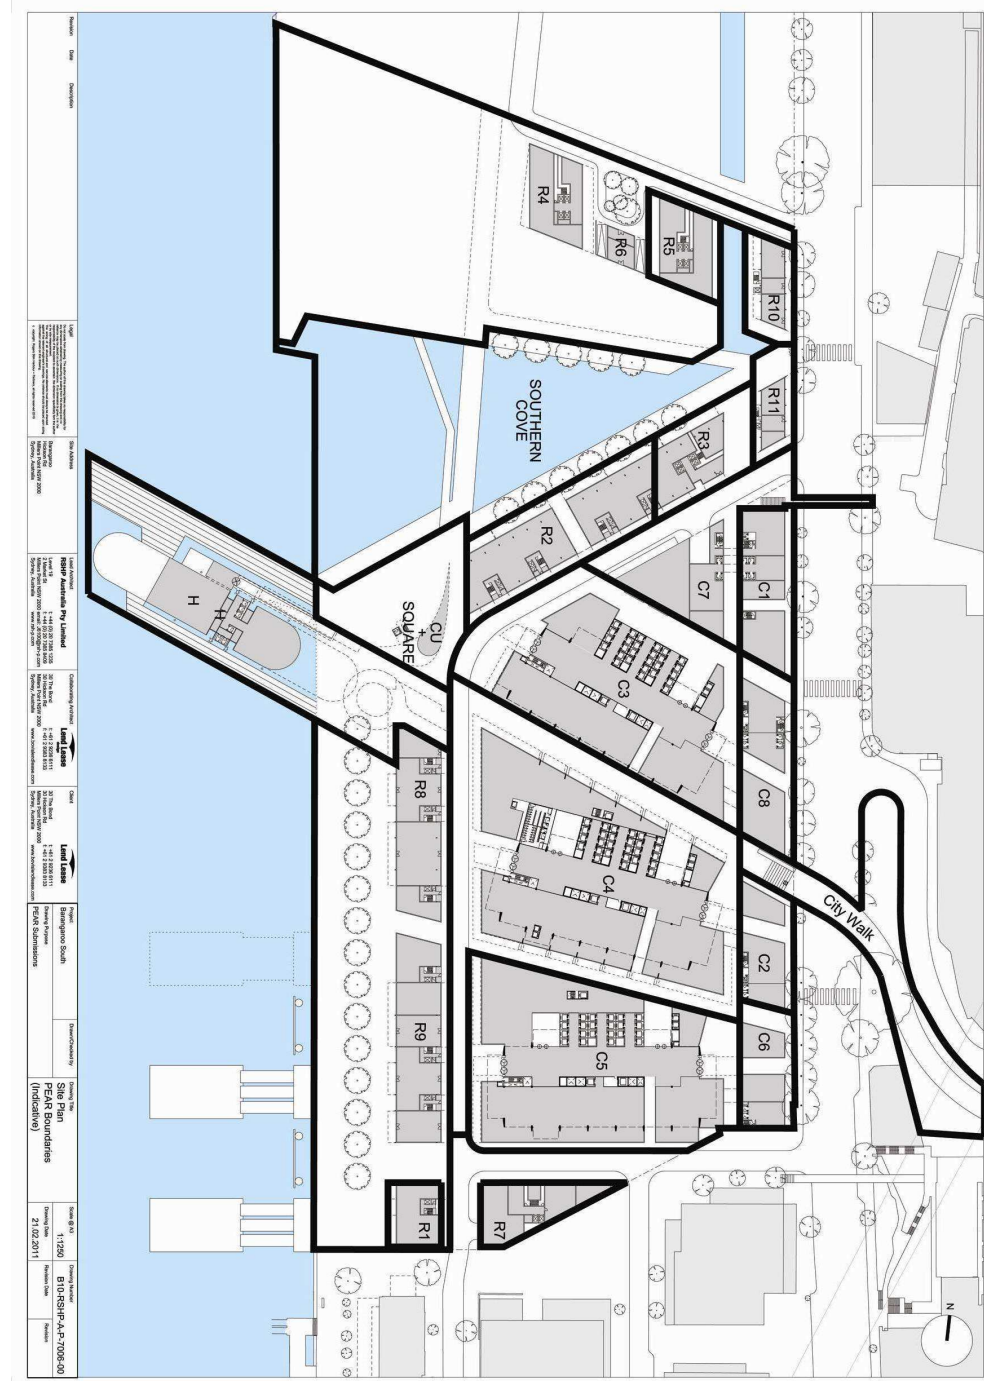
Overall site plan showing preliminary Project Application site boundaries
